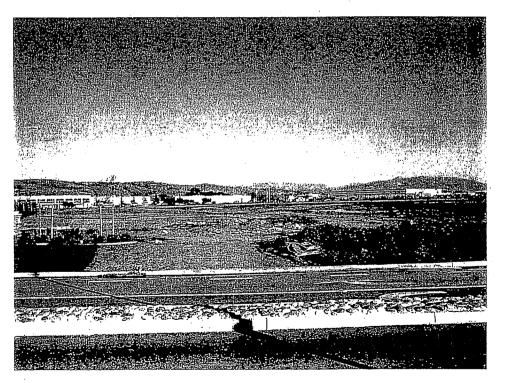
View to north along western boundary of the northern portion of the site. Retaining wall marks boundary of site.
